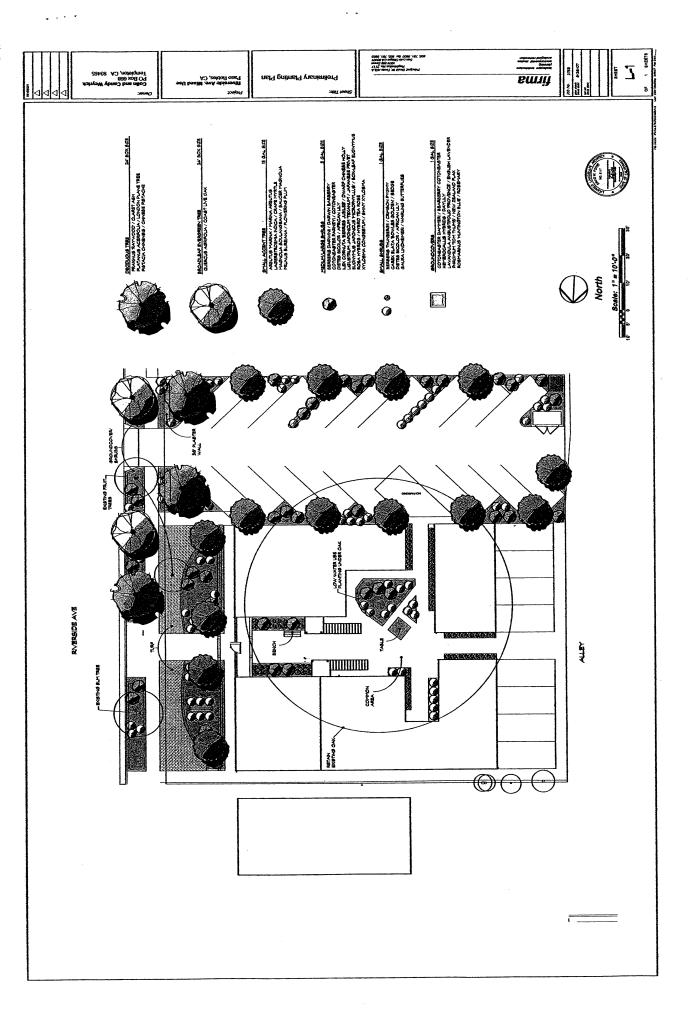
Exhibit F Preliminary Landscape Plan PD 07-010 (Weyrick)
